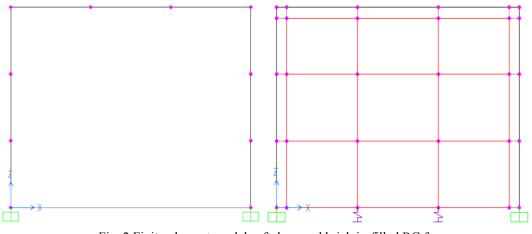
Finite-element models of plane and brick in-filled RC frames
